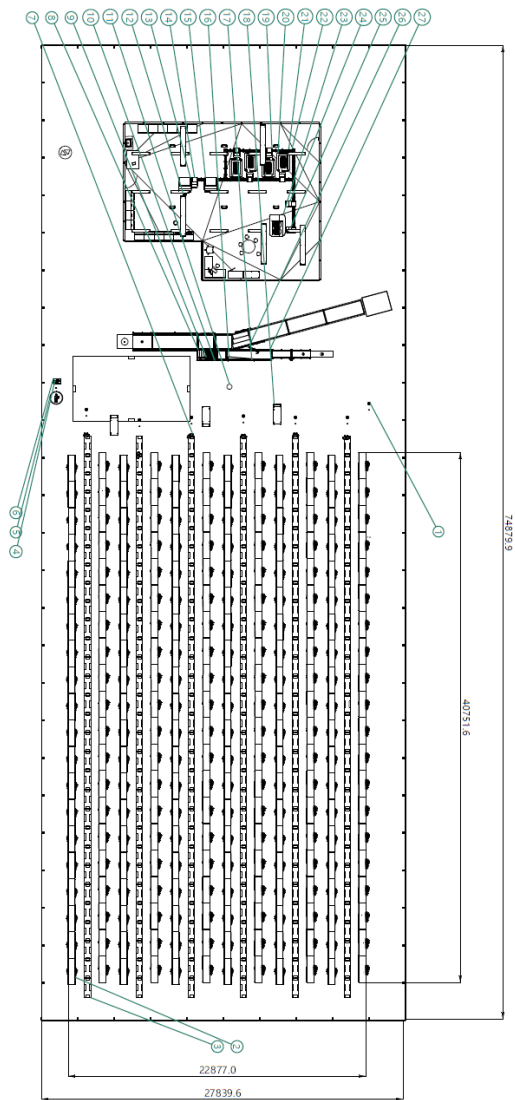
Floor plan of the greenhouse farm (Aeropod, 2024)
